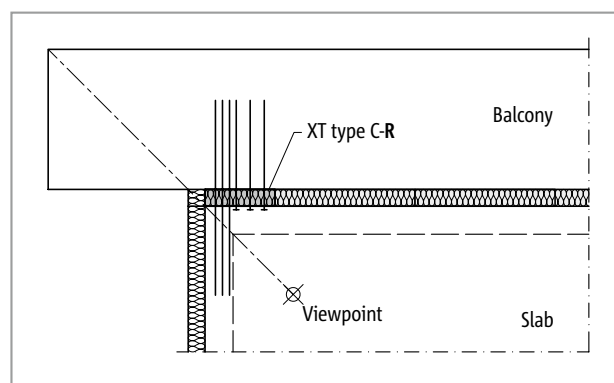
Schöck Isokorb® XT type C: Balcony projecting over corner of building (application XT type C-R)
